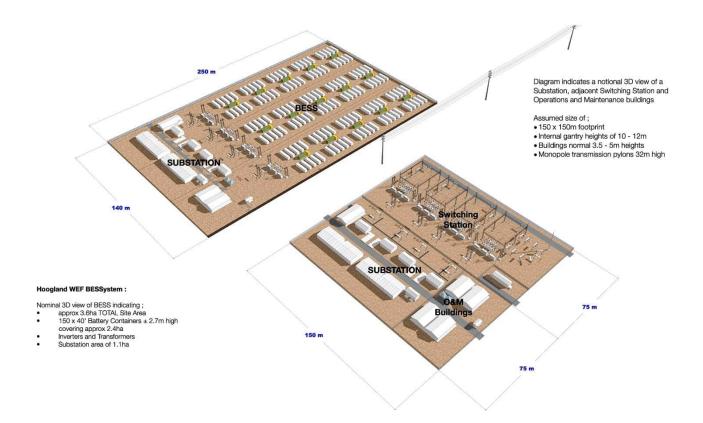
Indicative layout of BESS (Lithium ion, with substation), substation and switching station
